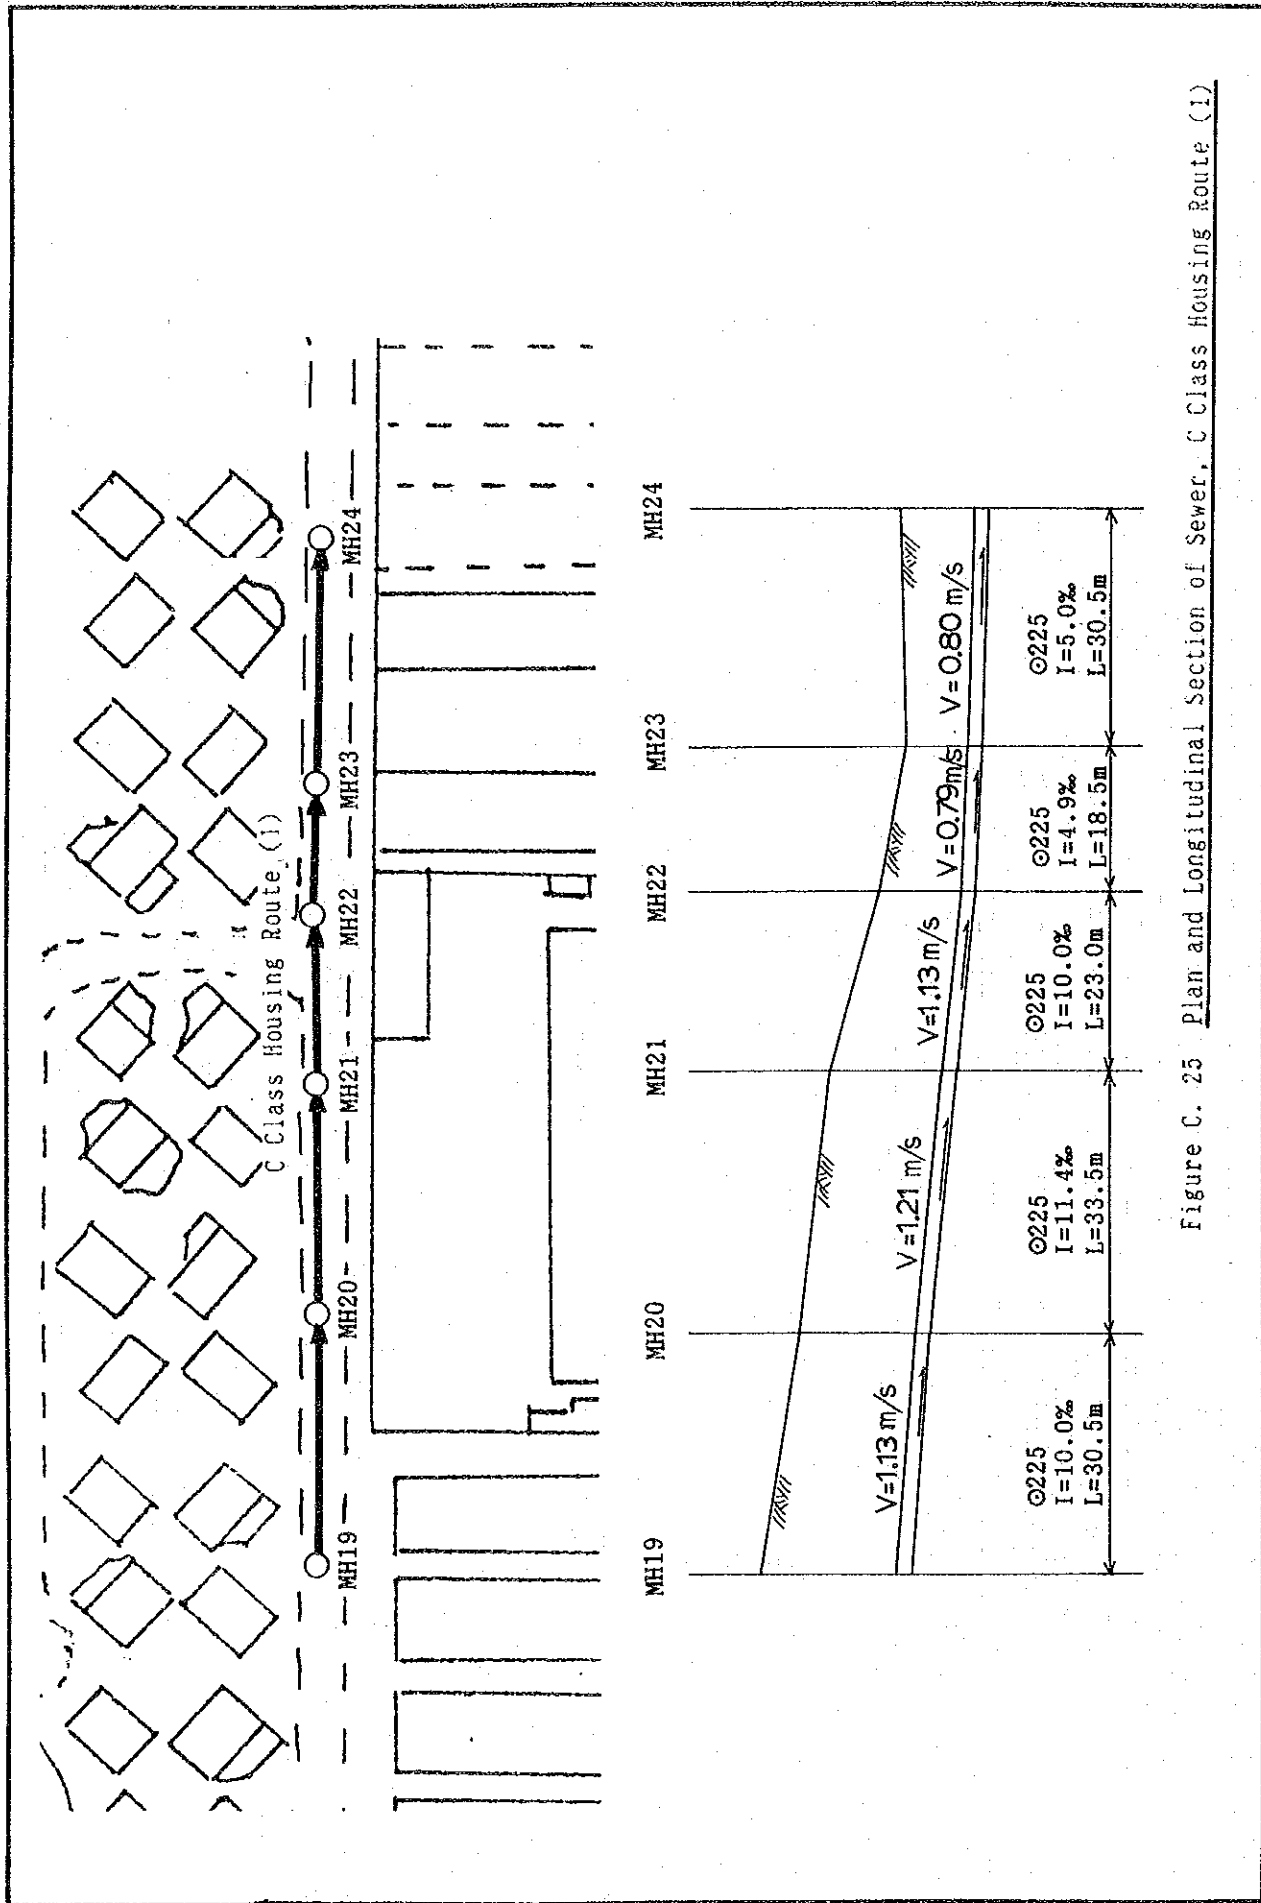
Plan and Longitudinal Section of Sewer, C Class Housing Route (1)
